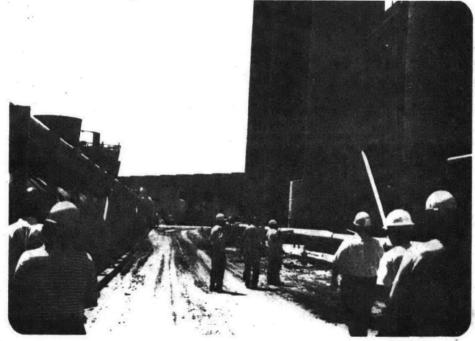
View from ground level facing south showing available space behind Stacks 1, 2, 3, and 4 on the east end of the plant.
